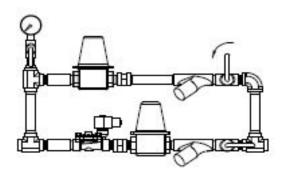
Fire Pump Drive Engine Bypass Valve
